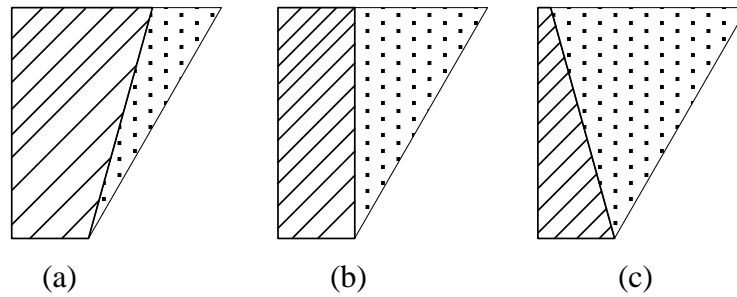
Wall shape and the corresponding backfill failure wedge for (a) landward-leaning wall, (b) vertical-back wall, and (c) outward leaning wall (hatched area: wall material; grey area: backfill failure wedge)
